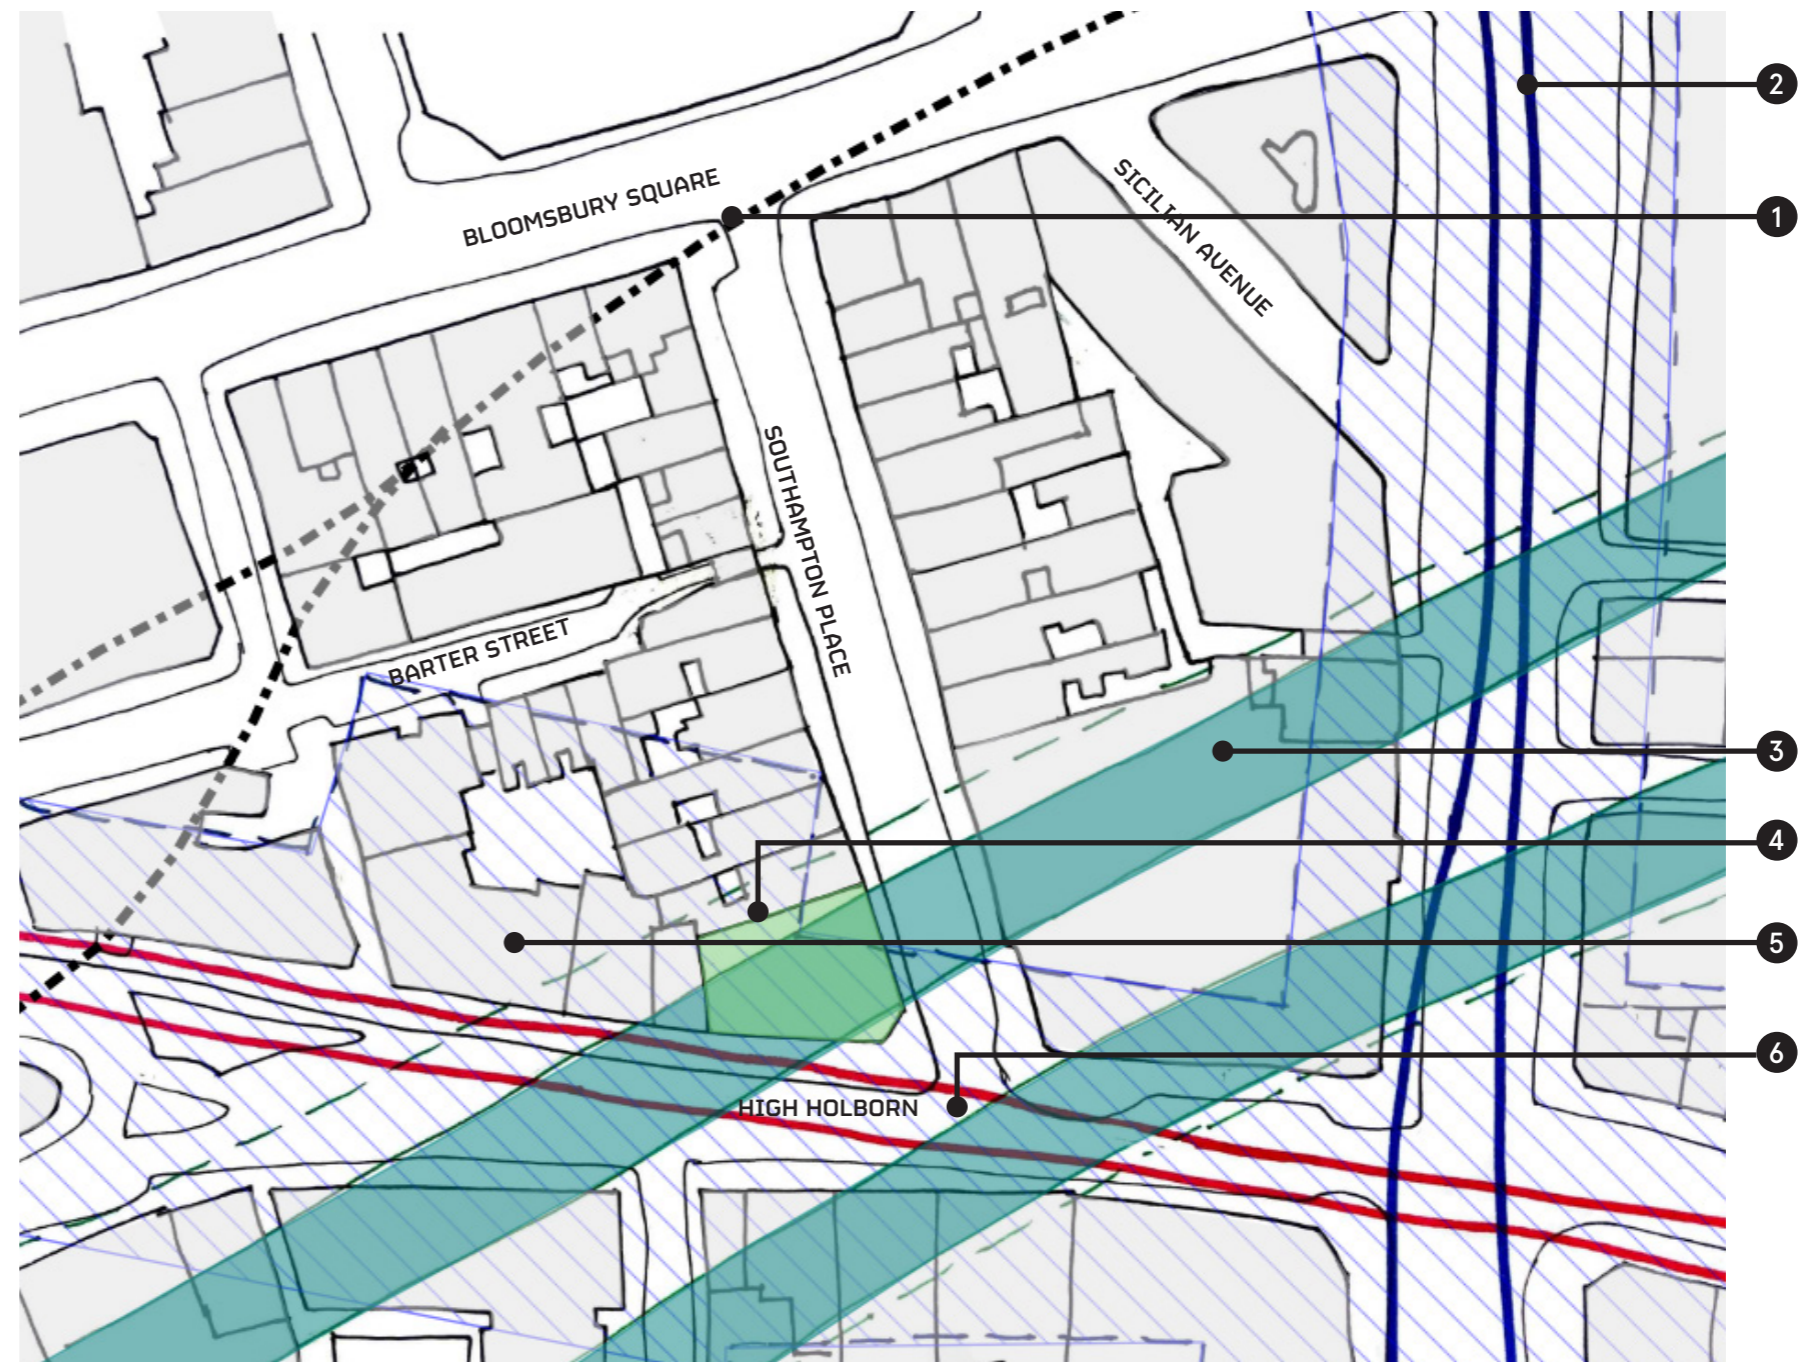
SKETCH OF TUNNELS BENEATH SITE
